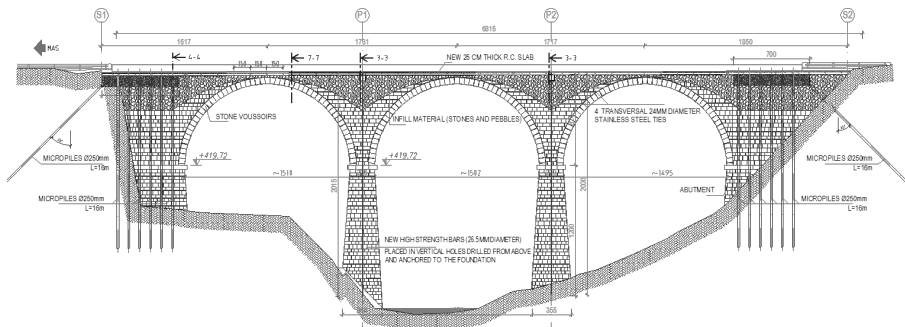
Longitudinal section with new structural elements (rc slab, micropiles and vertical ties)
